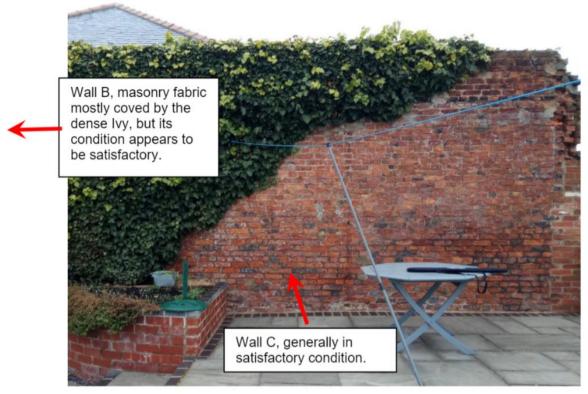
Wall C as viewed from the garden of No. 35 Ellison Street
